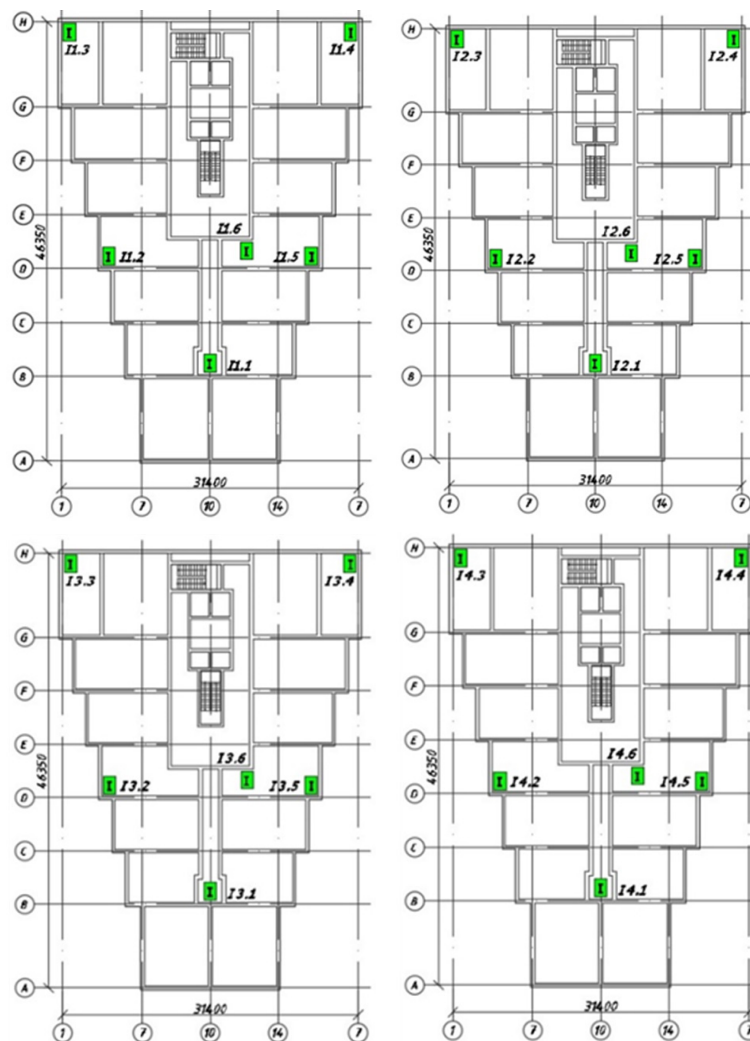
Location of inclinometers for the cross-wall structural system on 11, 22, 33, 44 floors
